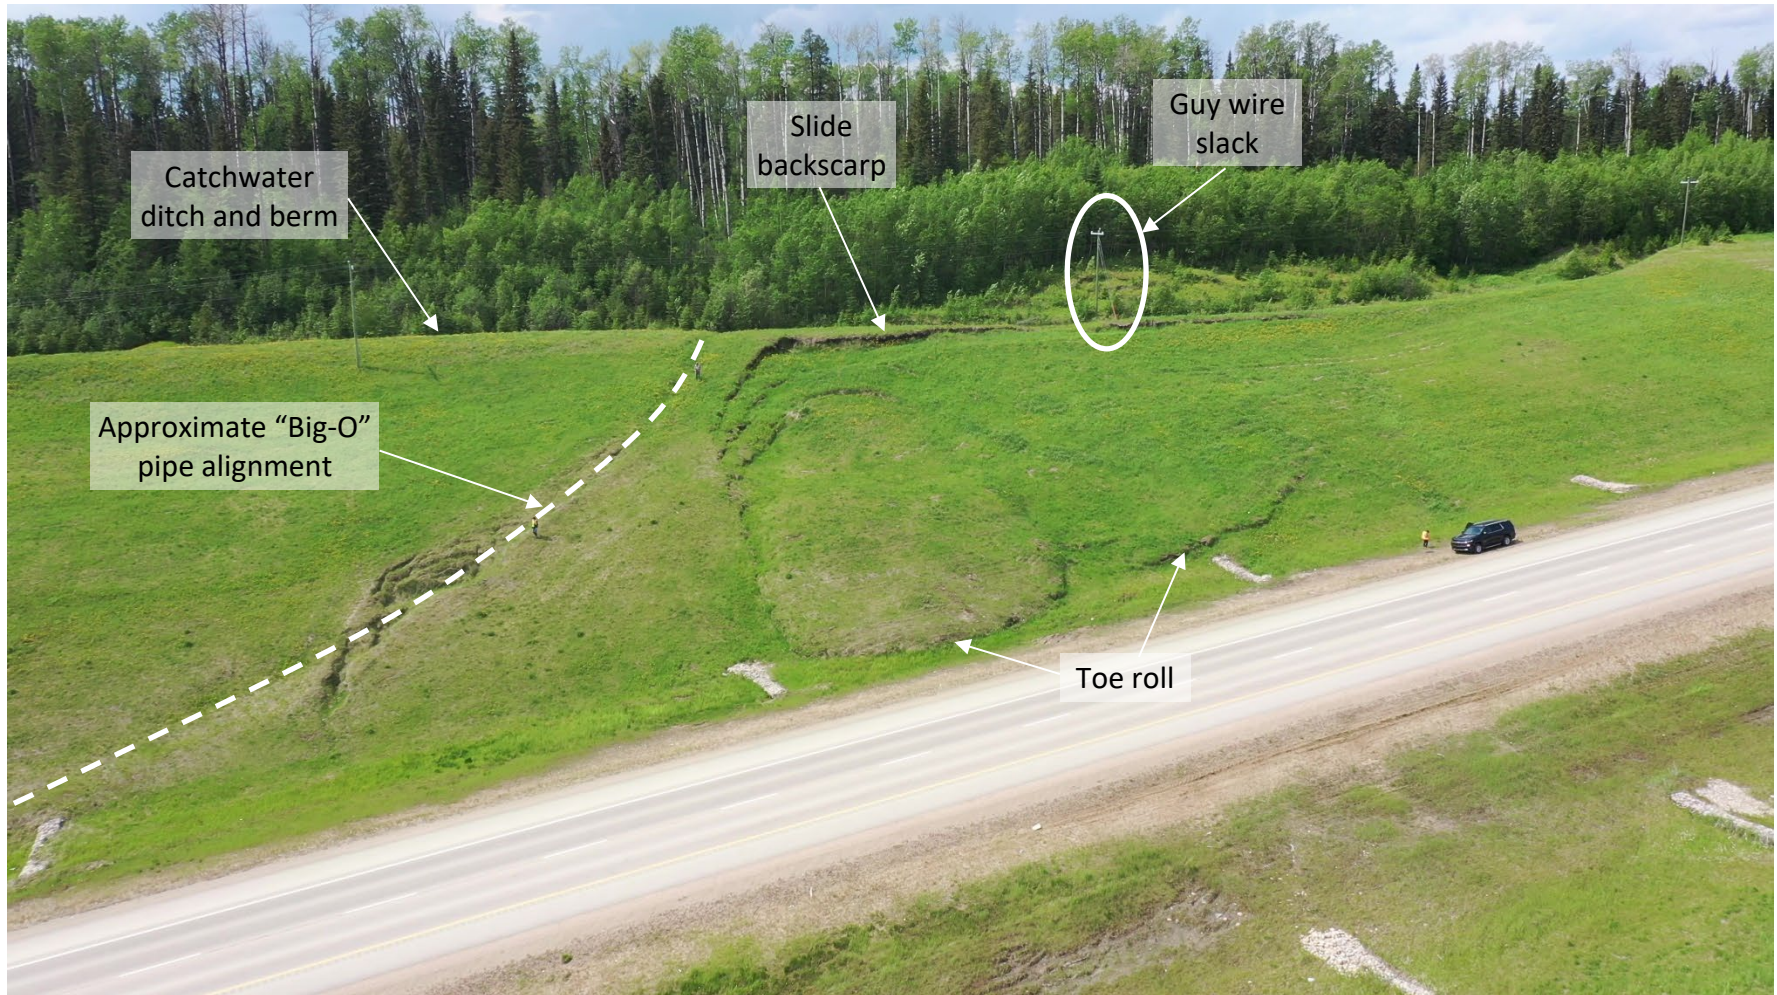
Slack power-pole guy wire at crest of backslope at WP229. Guy wire anchored adjacent to slide backscarp. Photo taken June 16, 2022, facing northwest.
